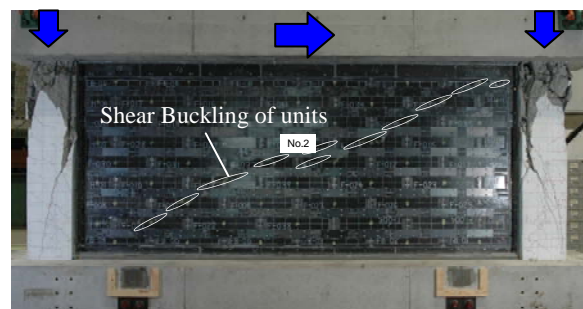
Failure mode of CFRP infilled frame specimen (No.2)
